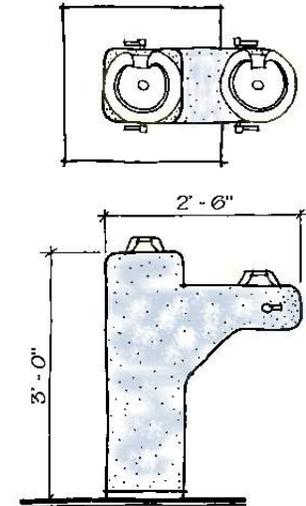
A handicapped accessible concrete drinking fountain is recommended for high visibility areas.
